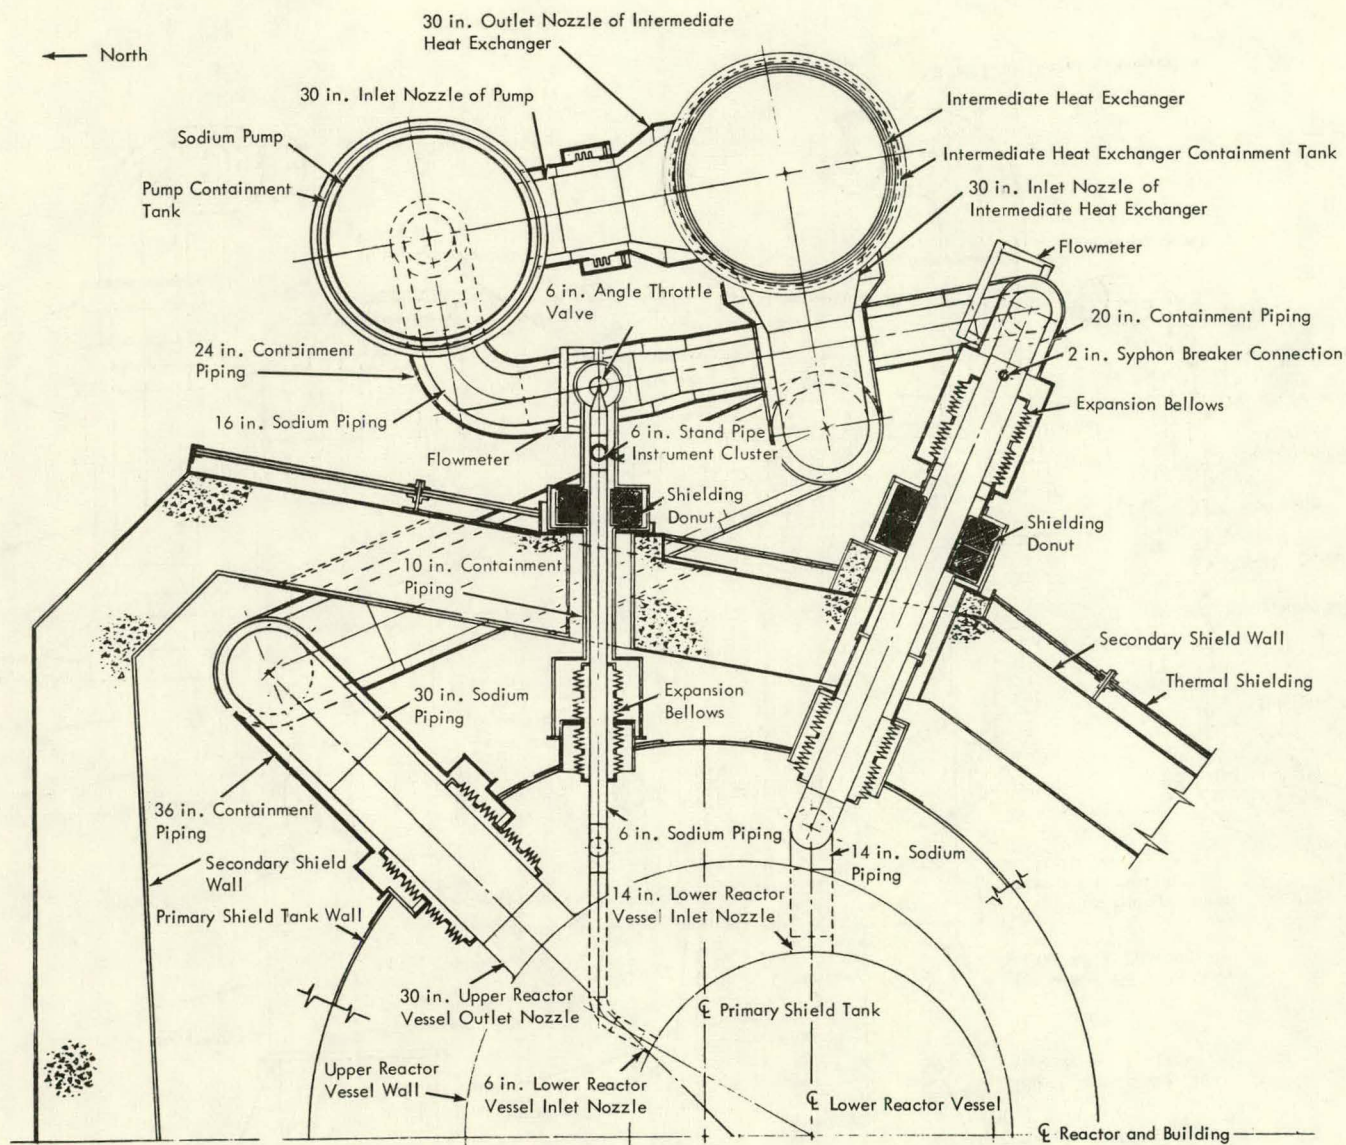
PLAN VIEW OF PRIMARY PIPING
